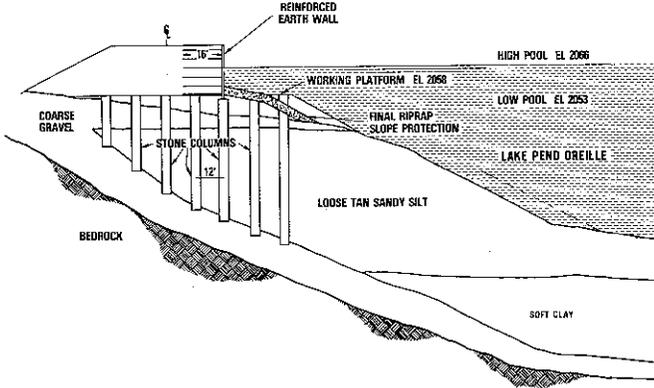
Stone Column - Reinforced Earth Solution - Station 334+00 Clark Fork Highway, Idaho
